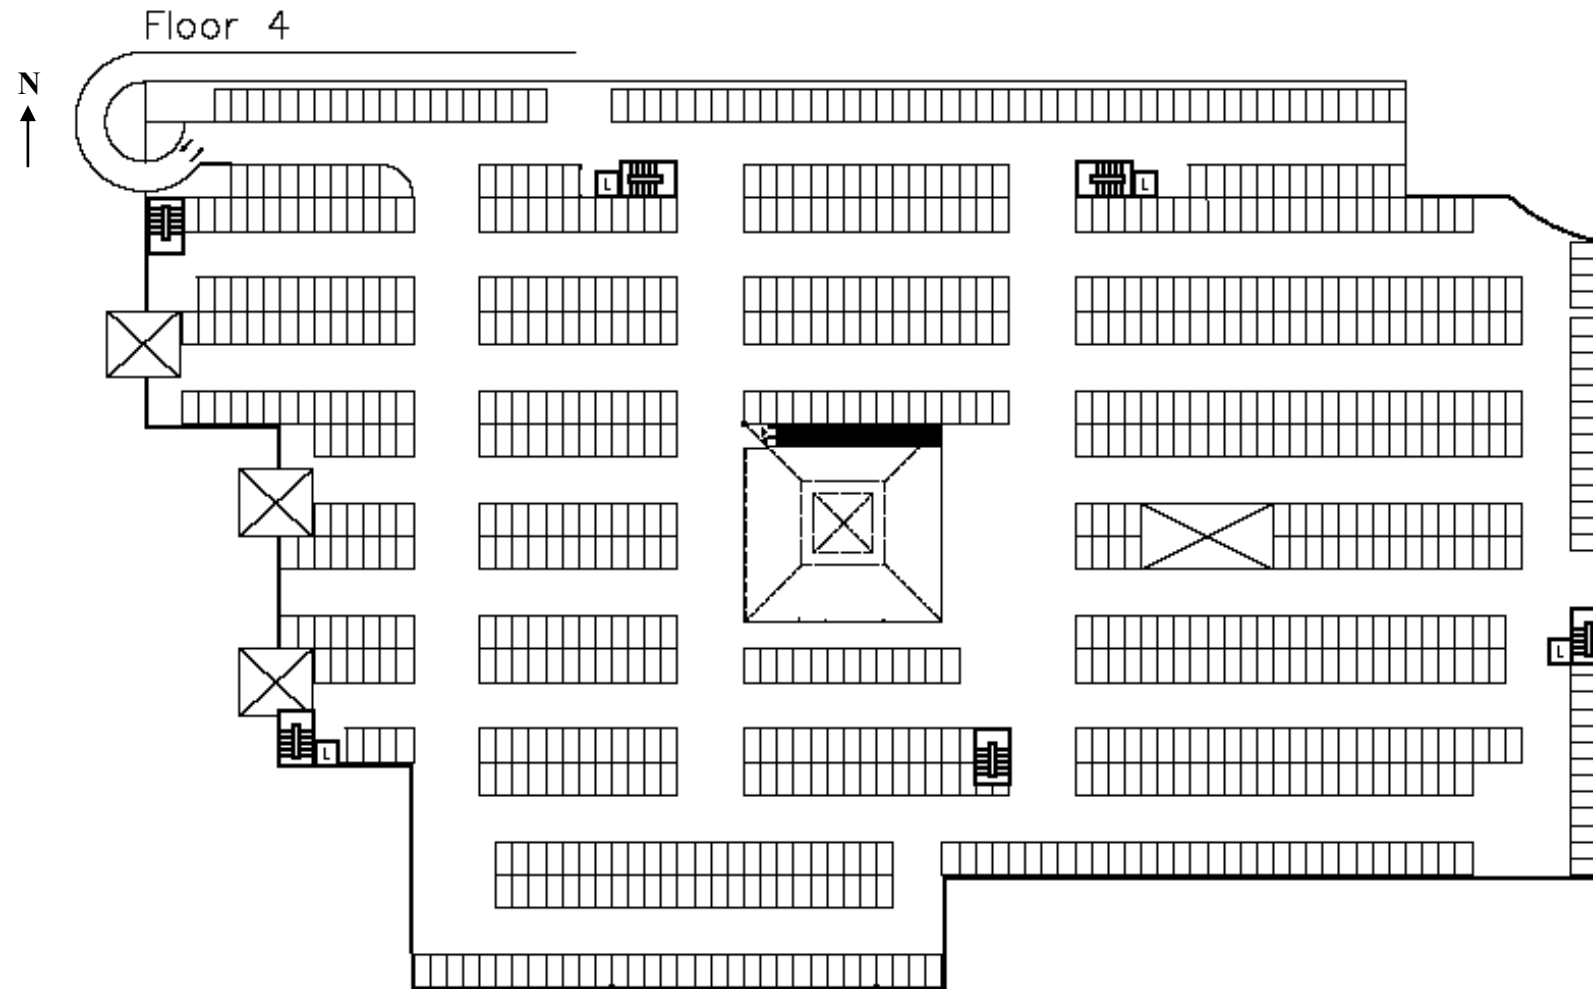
Designed Shopping Mall Building Plan – Floor 4
